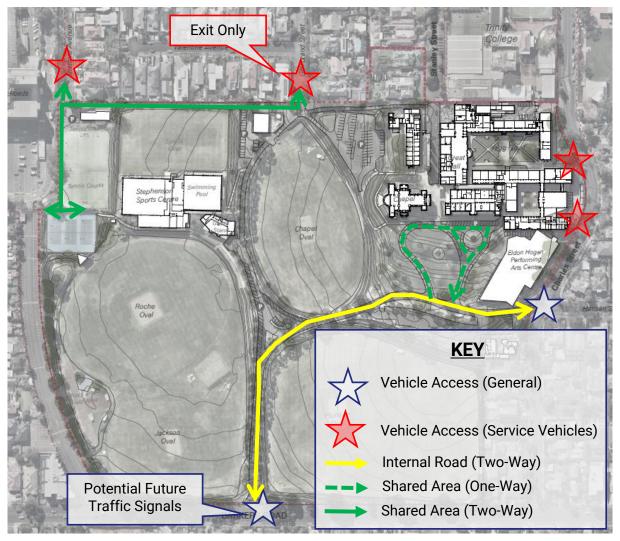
Figure C: Vehicle Access Arrangements & Internal Road Network – Development Plan
